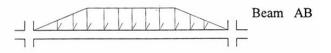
Trapezoidal distributed load for Beam AB of Fig. 2-16.
